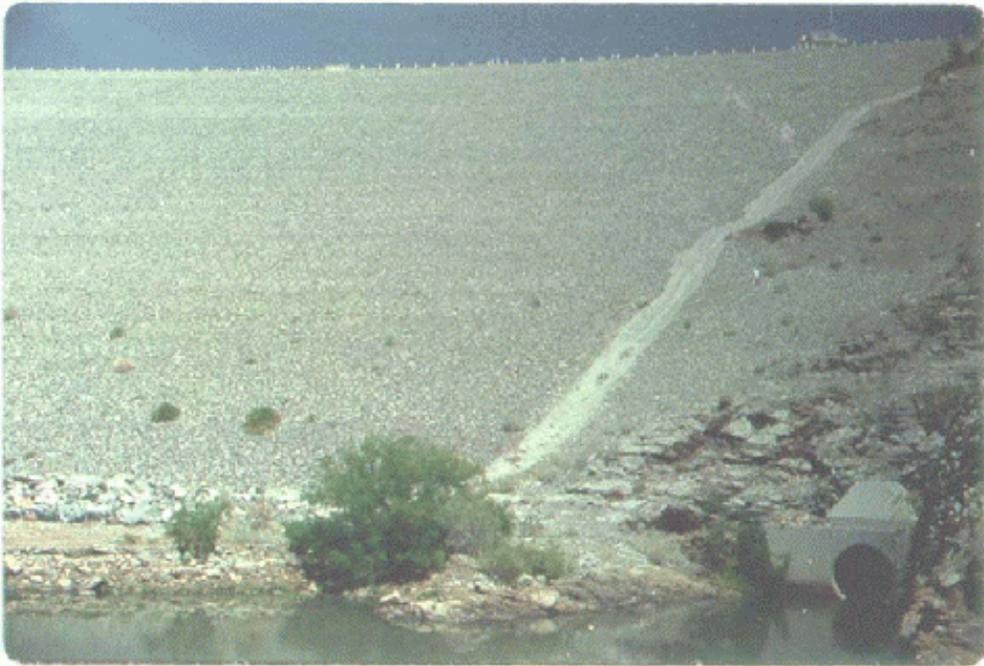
Downstream face of Alamo Dam. Outlet works tunnel is in lower right hand corner.
